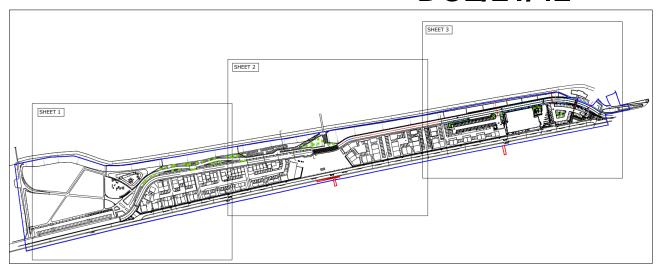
Site Plan showing location of the pipes within the wider site area.
